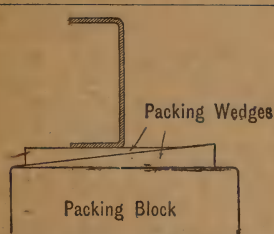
Adjusting Level of Frame by Wedge Packing
